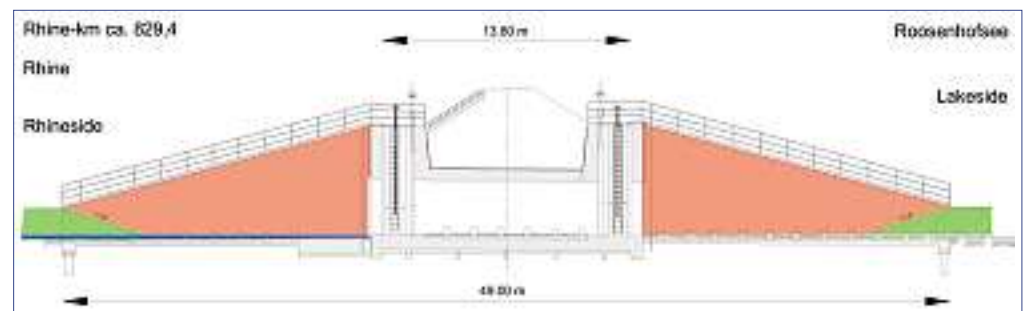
Inlet structure, cross section with illustration of temporary adaptation to the averting dike
